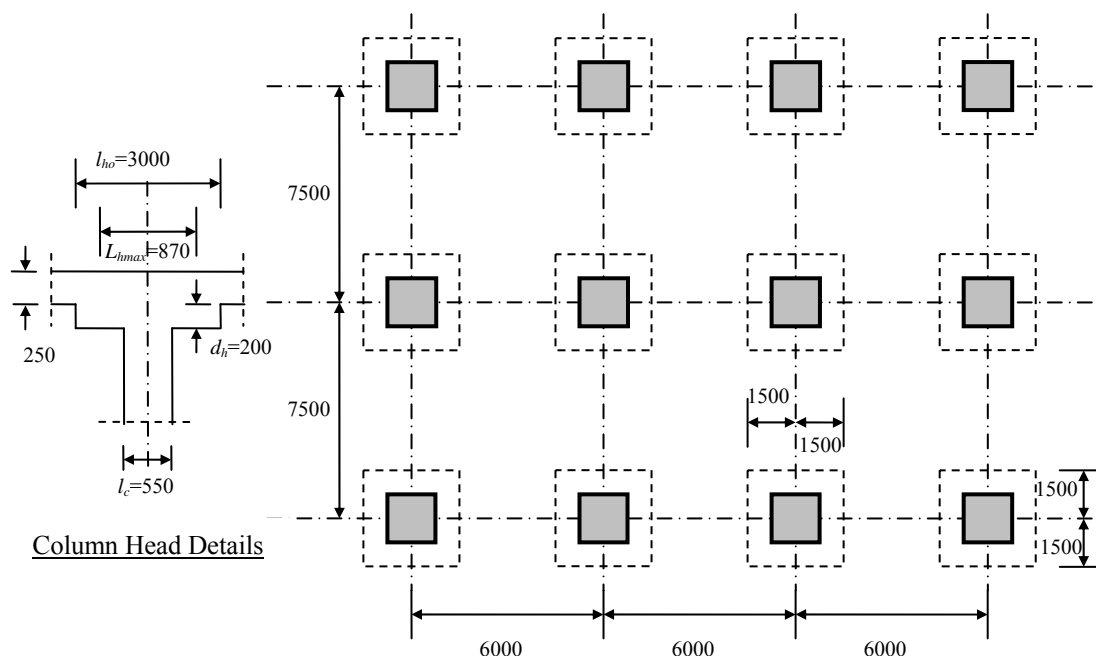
Flat Slab Plan Layout for Worked Example 4.4
